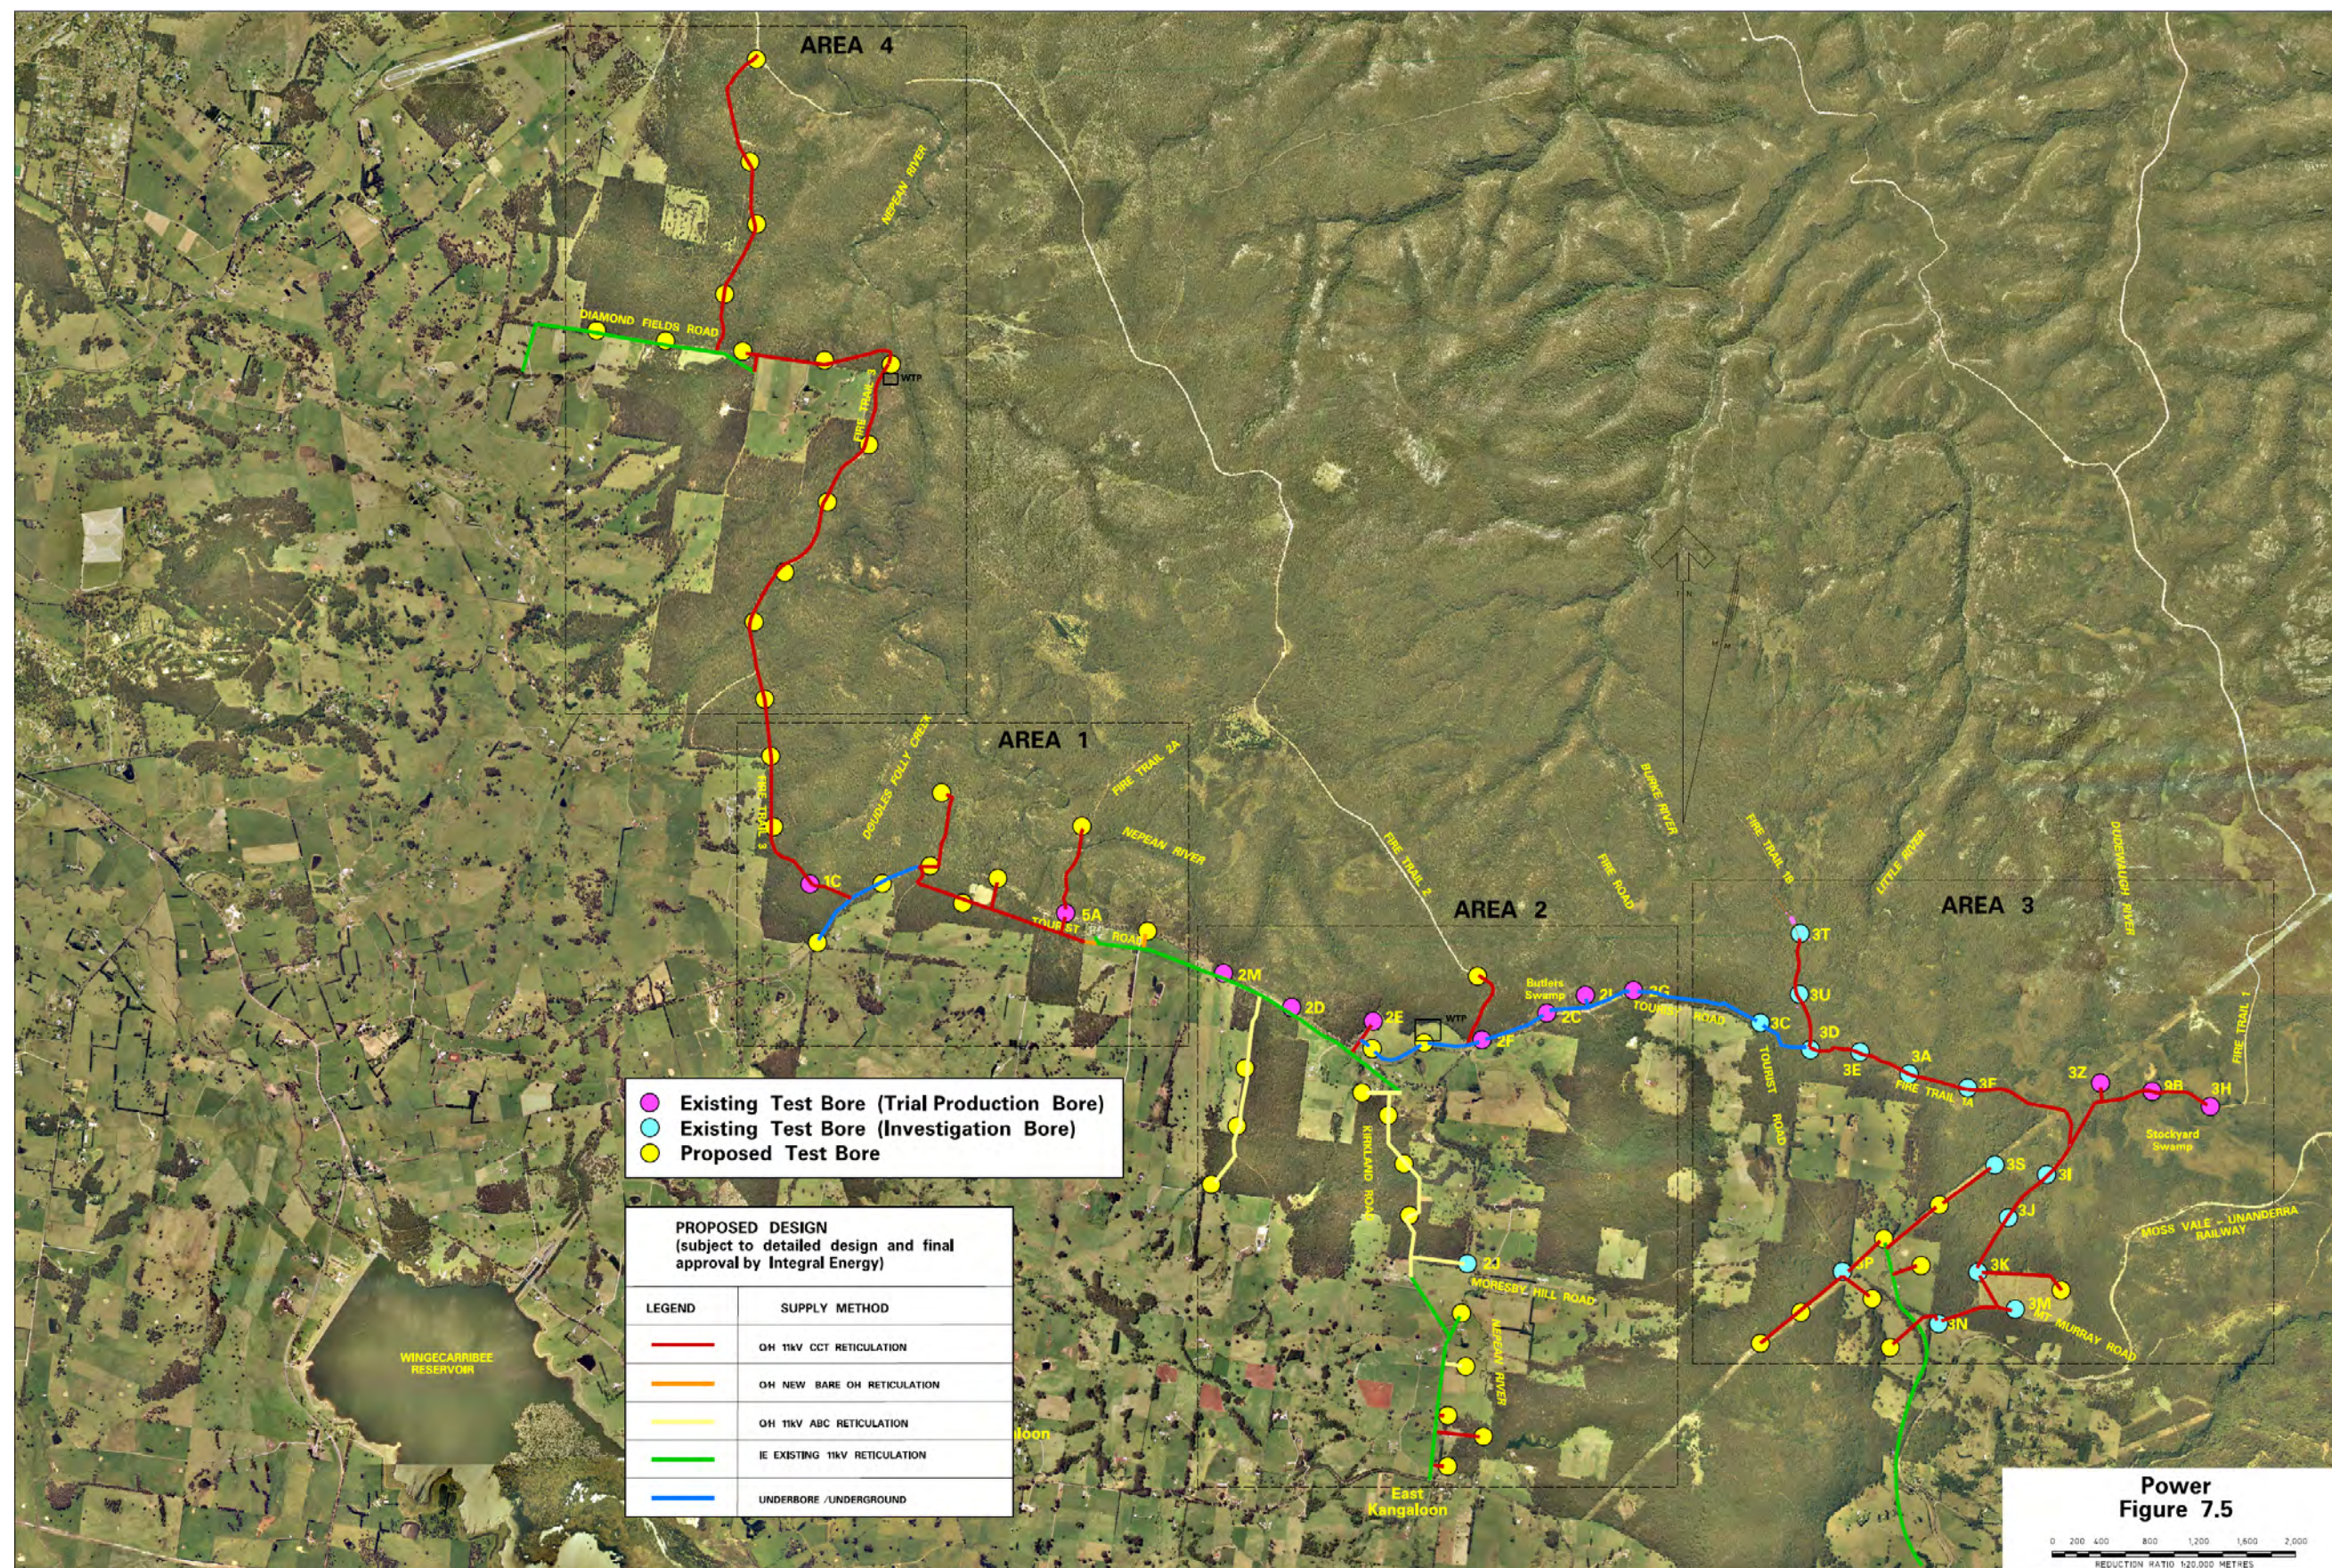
Kangaloon Borefield – Proposed power layout and design
